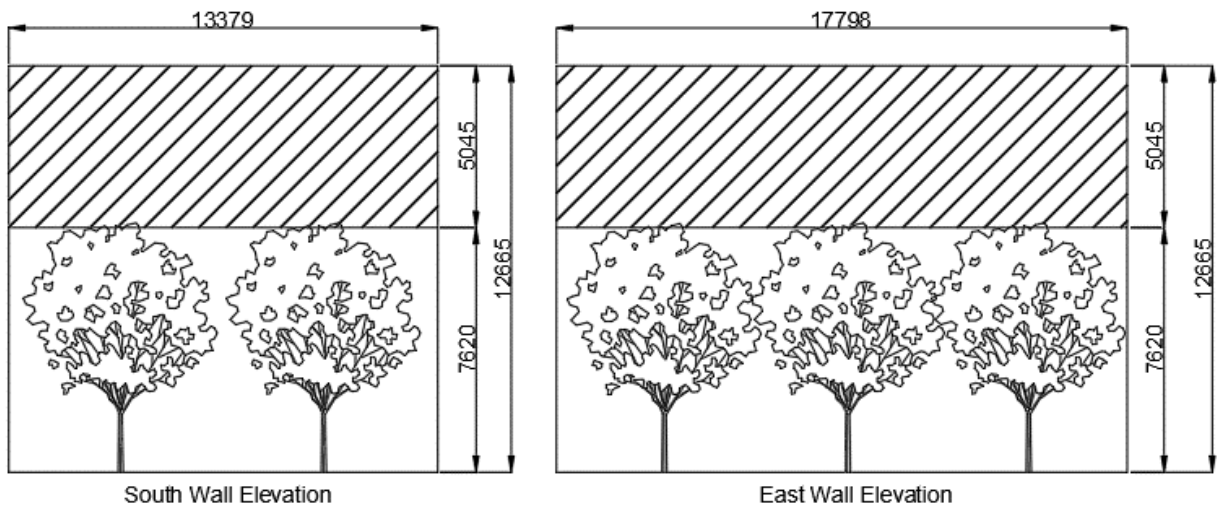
Elevation drawings of the east and south walls showing shaded area provided by design layout 2.
